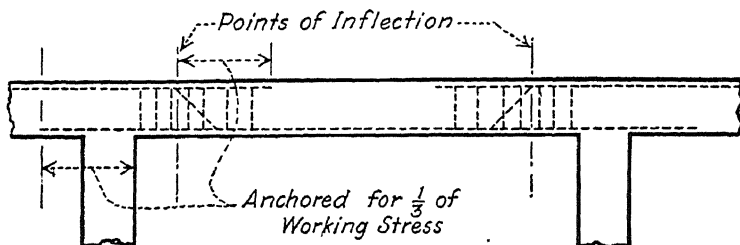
Typical Web Reinforcement for Continuous Beams with Special Anchorage.
